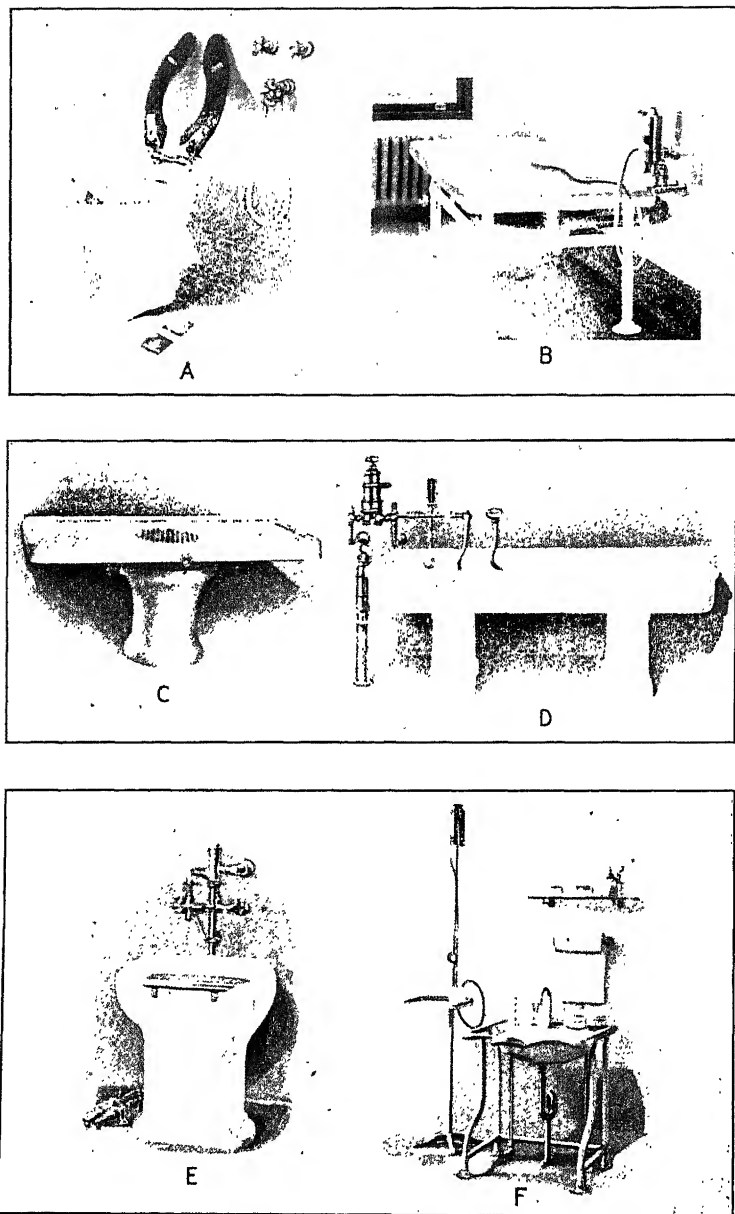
Special types of hospital fixtures. (Courtesy J. L. Mott Company.)
